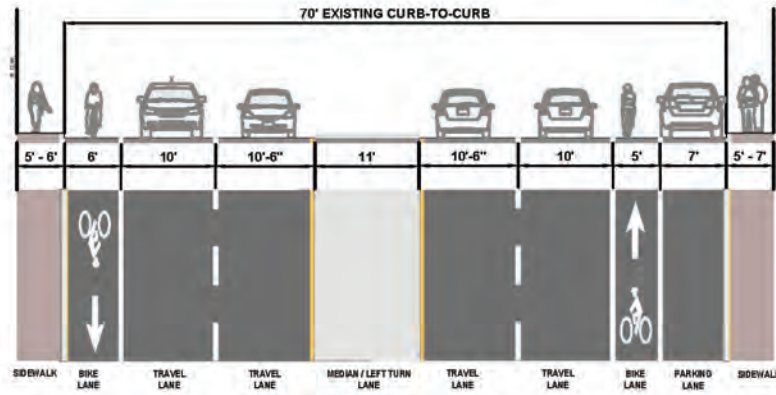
Industrial Road Existing Typical Section B (Facing North)
